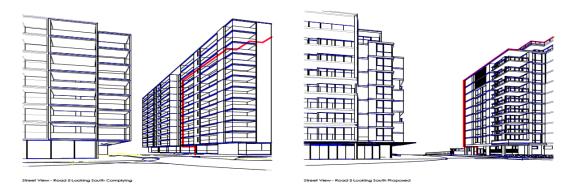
Previously submitted Road 5 South Street View vs Complying Scheme Street View (Source: Kann Finch)
